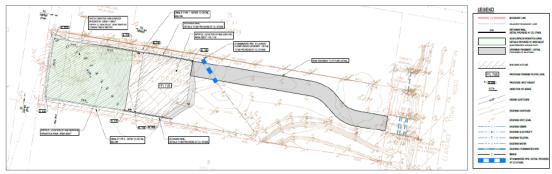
Civil plans (swales and retaining walls directing flows to Jackass Creek and Clarence Town Road)
